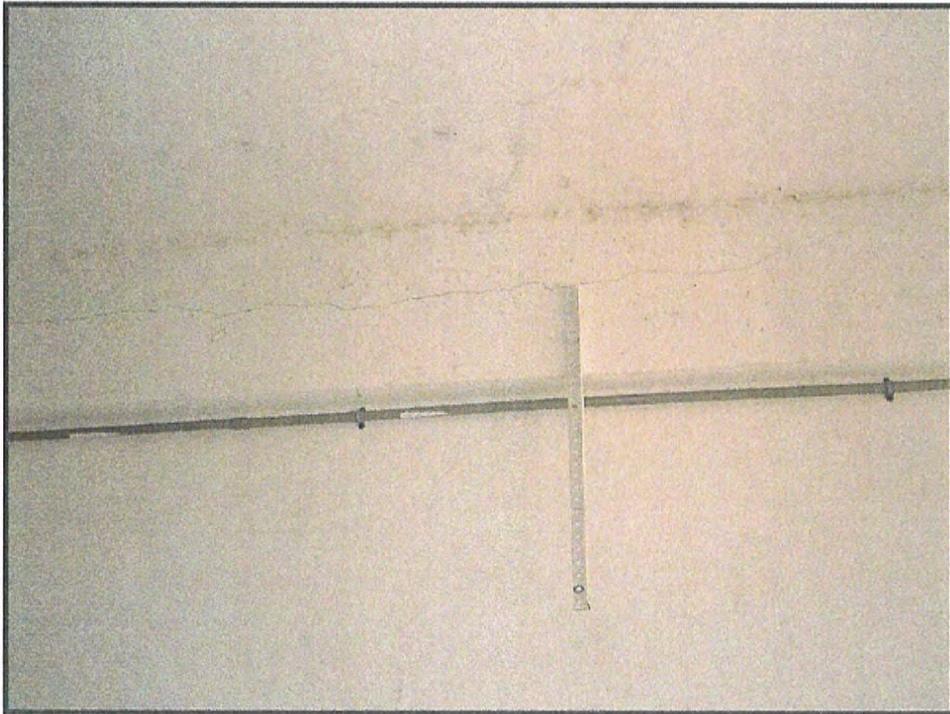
Horizontal crack outlining the delamination along the side face of 2nd level transverse support beams. Condition is typical for beams within service areas.
